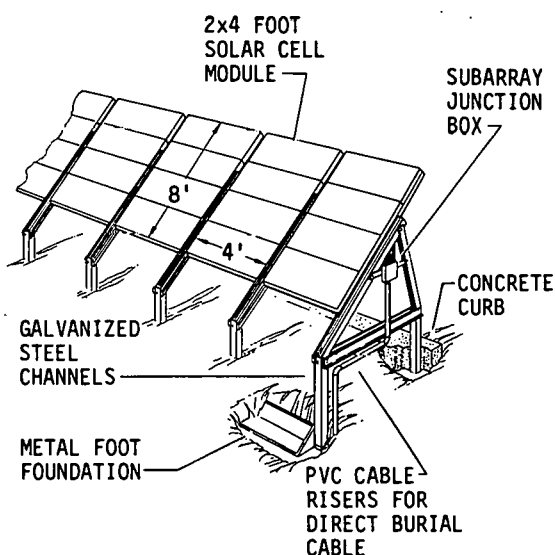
Illustration of Subarray Structure and Hybrid Foundation Design
